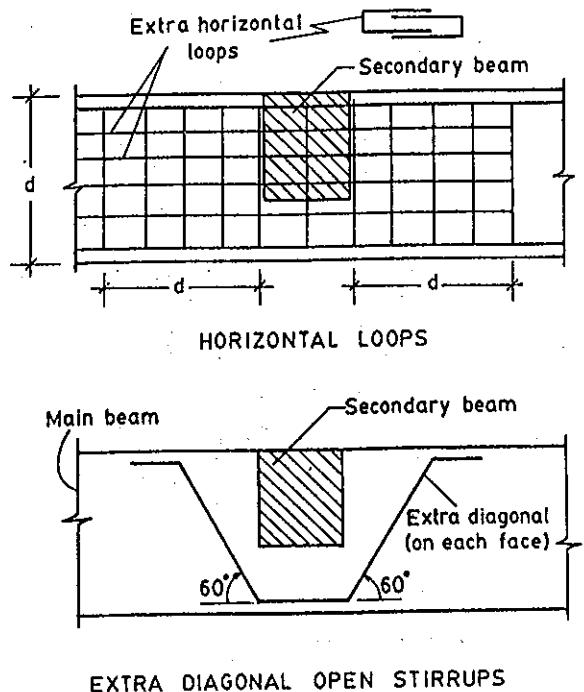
Reinforcement Detailing at Junction of Beams
